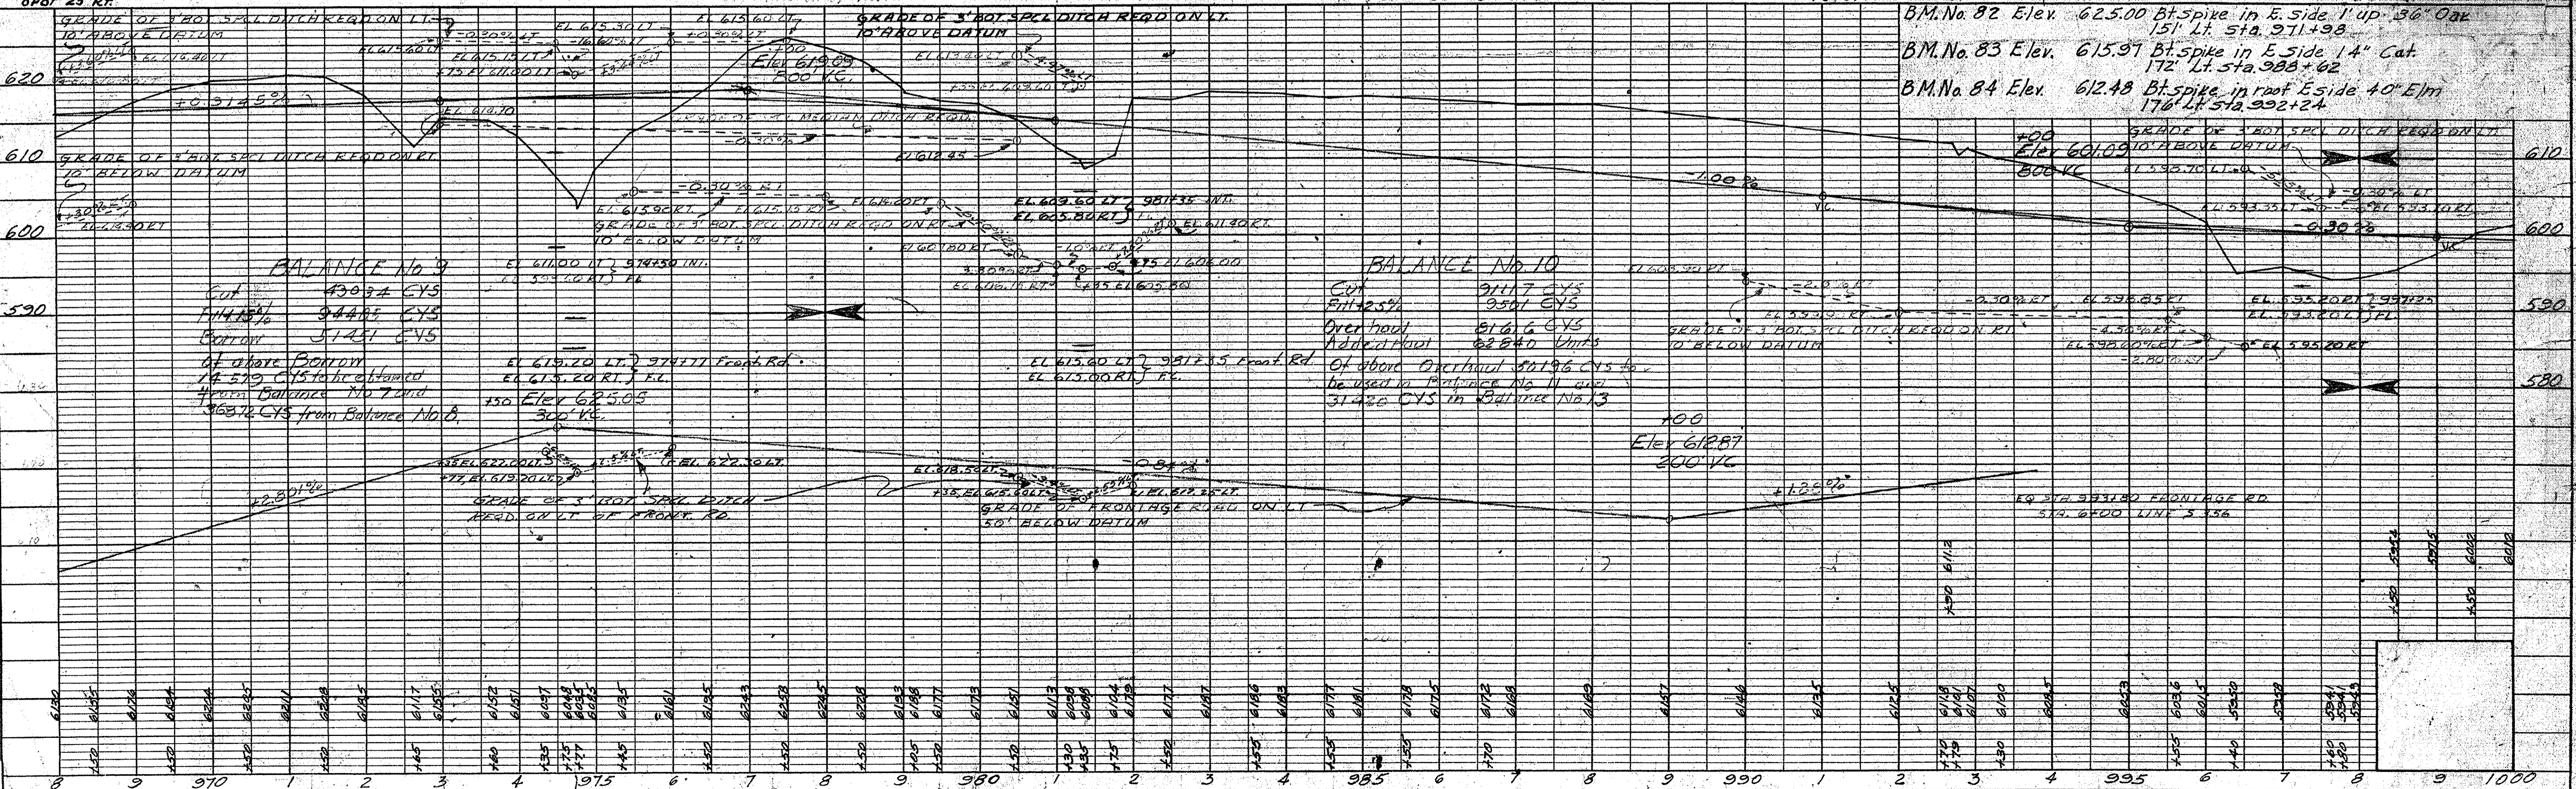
PLAN - PROFILE - O. P. R. & R. E. STANDARD
